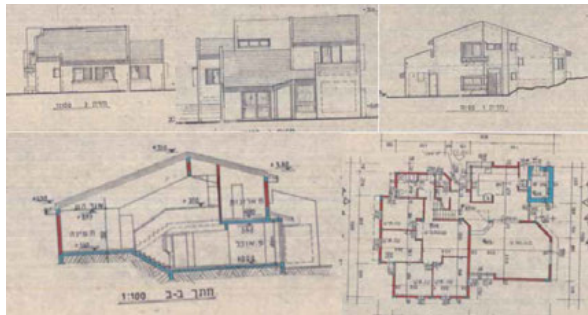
C model House - upper row: main facade to street, backyard façade, side façade. Lower row: Section (Note the family area in the lower part and the bedrooms area in the upper one, oriented towards the street); Plan. Gil-Ad & Yosef Architects.
